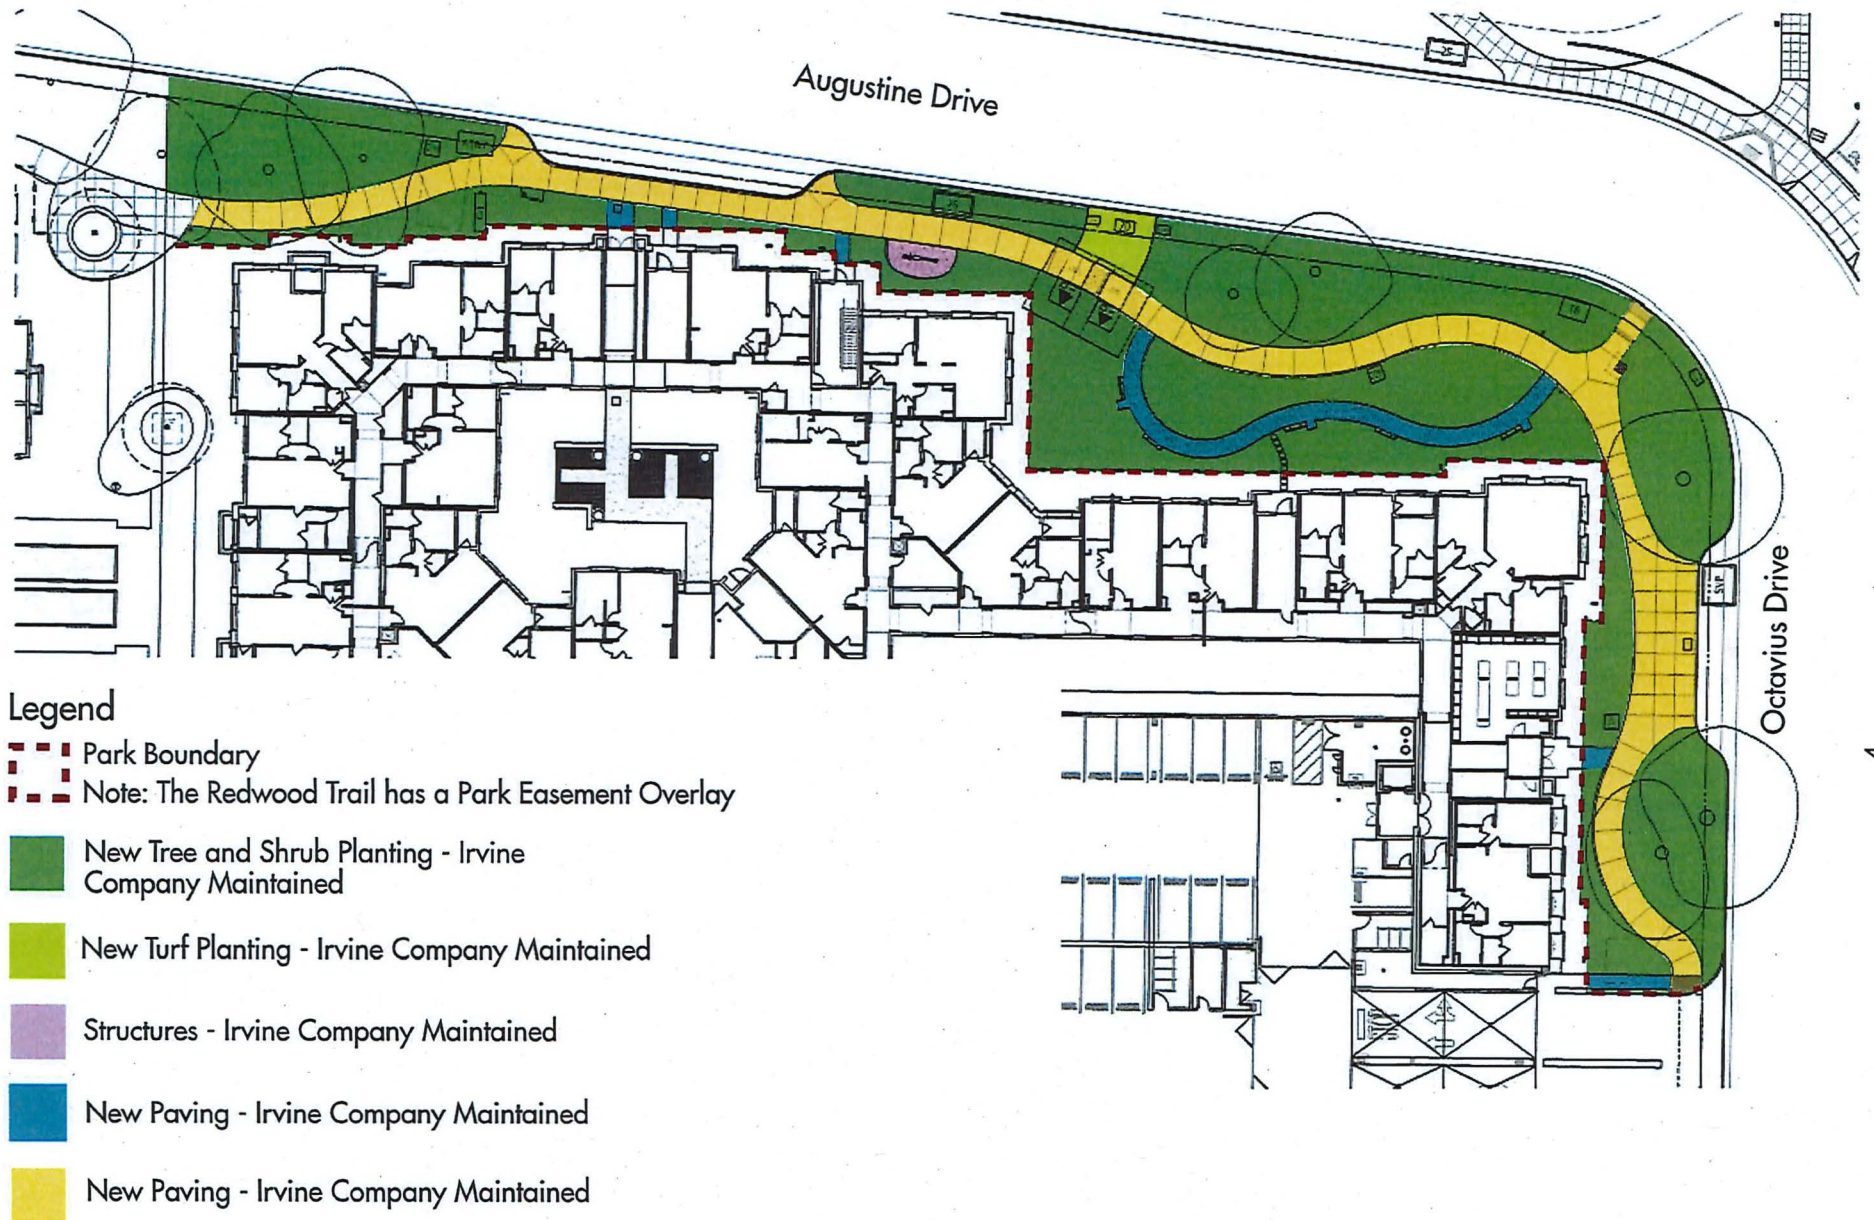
Exhibit B - Sheet 2 of 8 (Redwood Trail)
